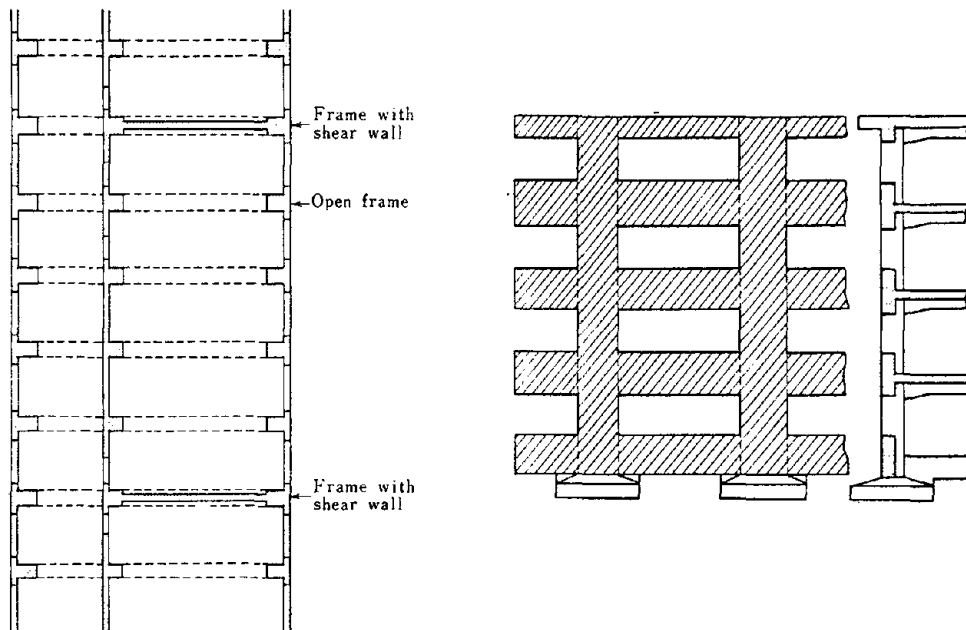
Typical geometries for frame and frame-wall construction [AIJ, 1970]
